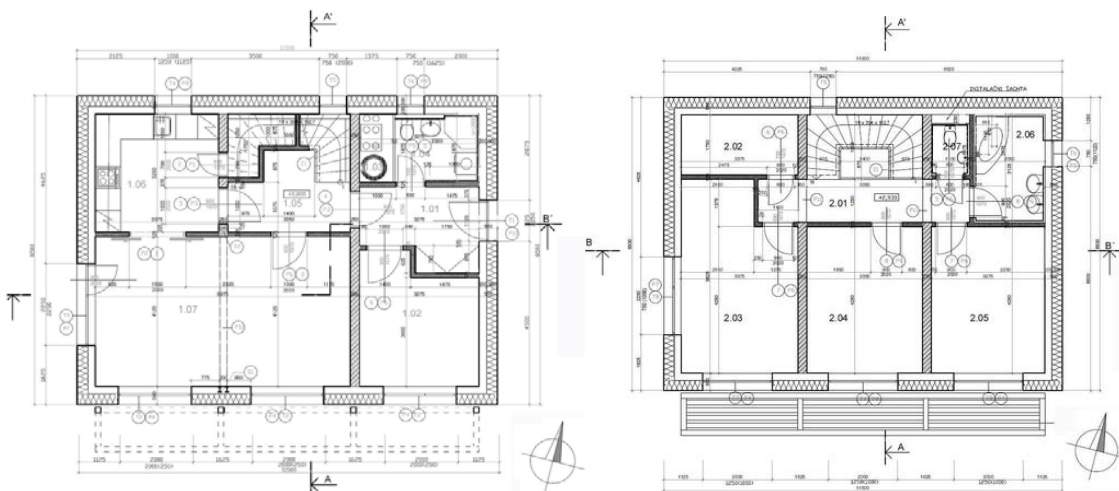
On the left – plan of 1st floor; on the right – plan of 2nd floor.
